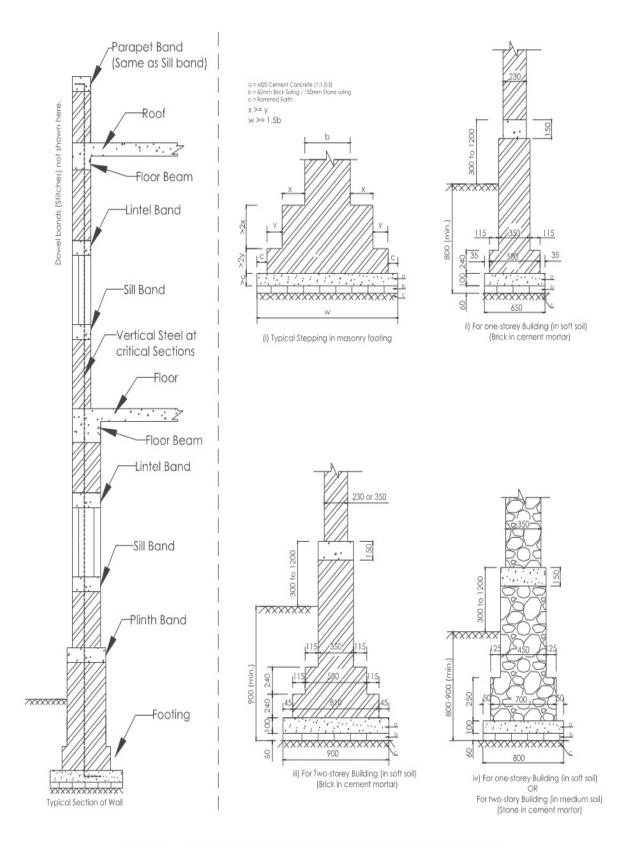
Wall Section and Stone/Brick Wall Footing Details
